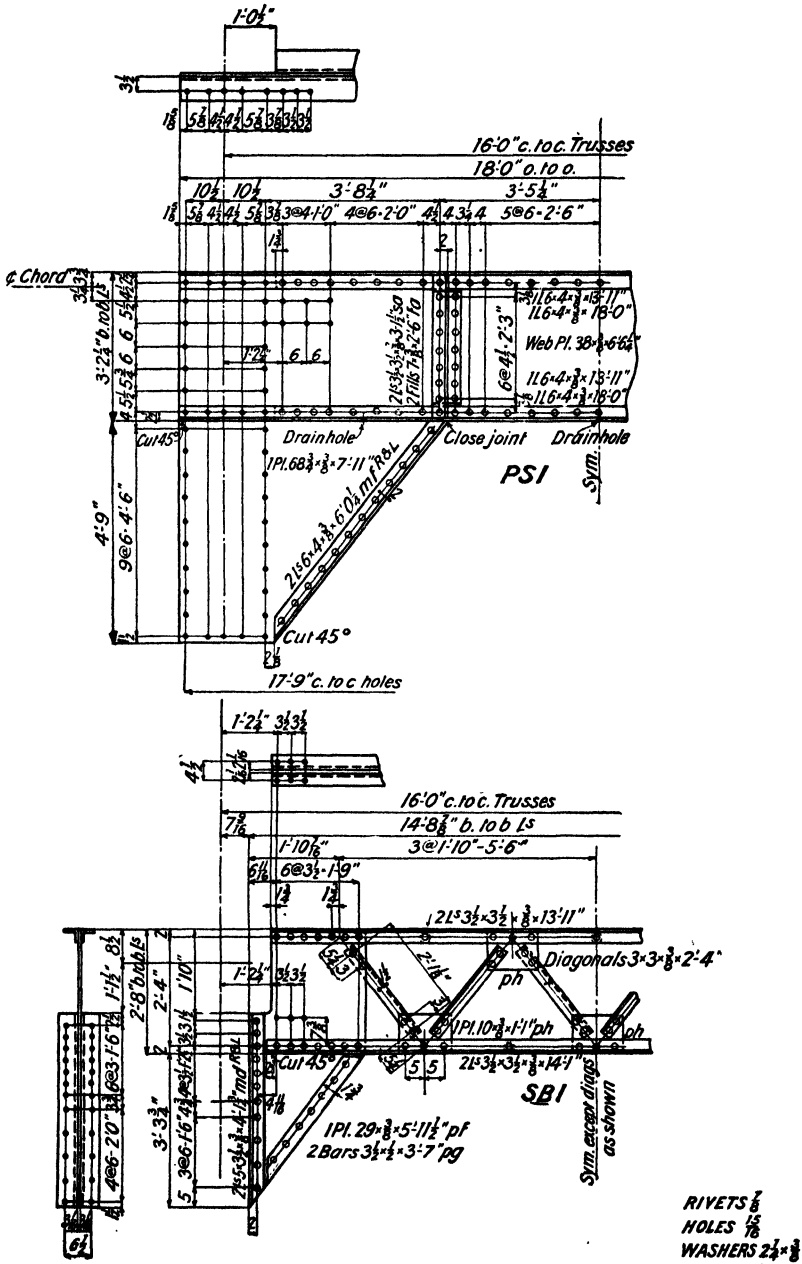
Portal Strut and Sway Brace for a Railroad Bridge.
